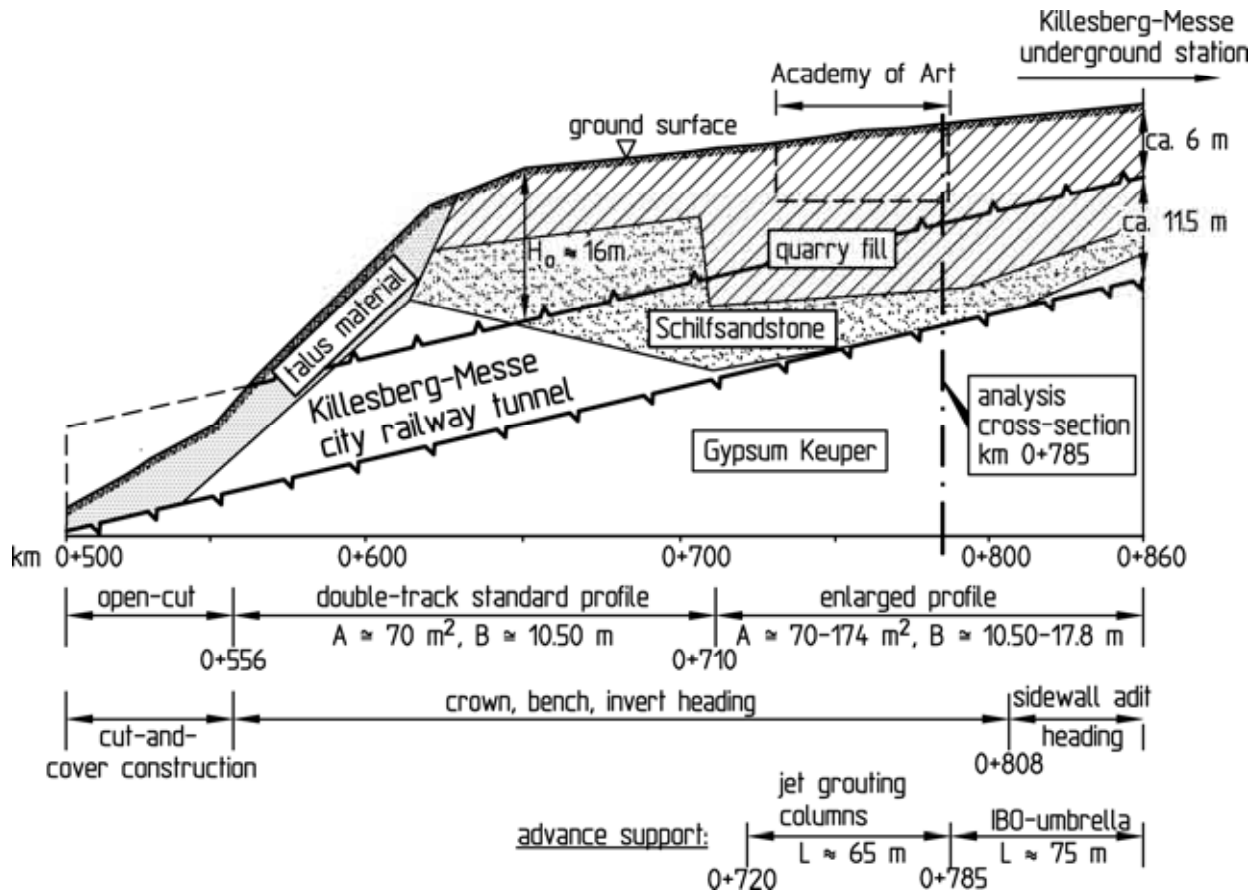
Killesberg-Messe city railway tunnel, longitudinal section with ground profile, excavation and support measures
